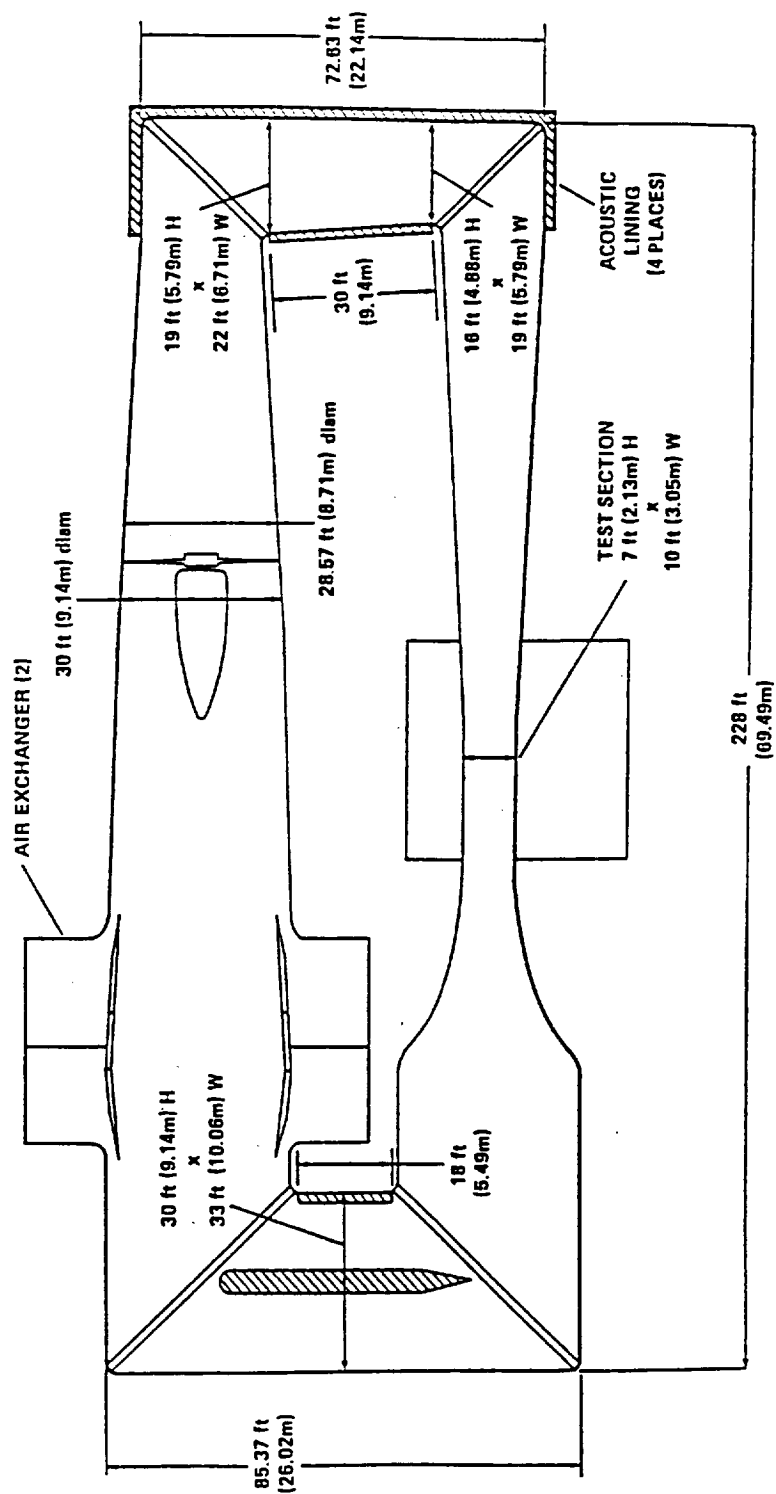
General layout of the NASA Ames 7x10 Foot Wind Tunnel No. 1.
